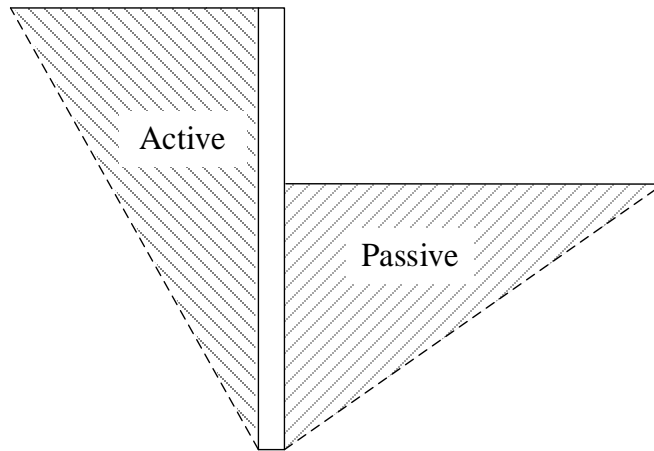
Simplified failure mechanism showing active and passive zones for a sheet pile wall.
